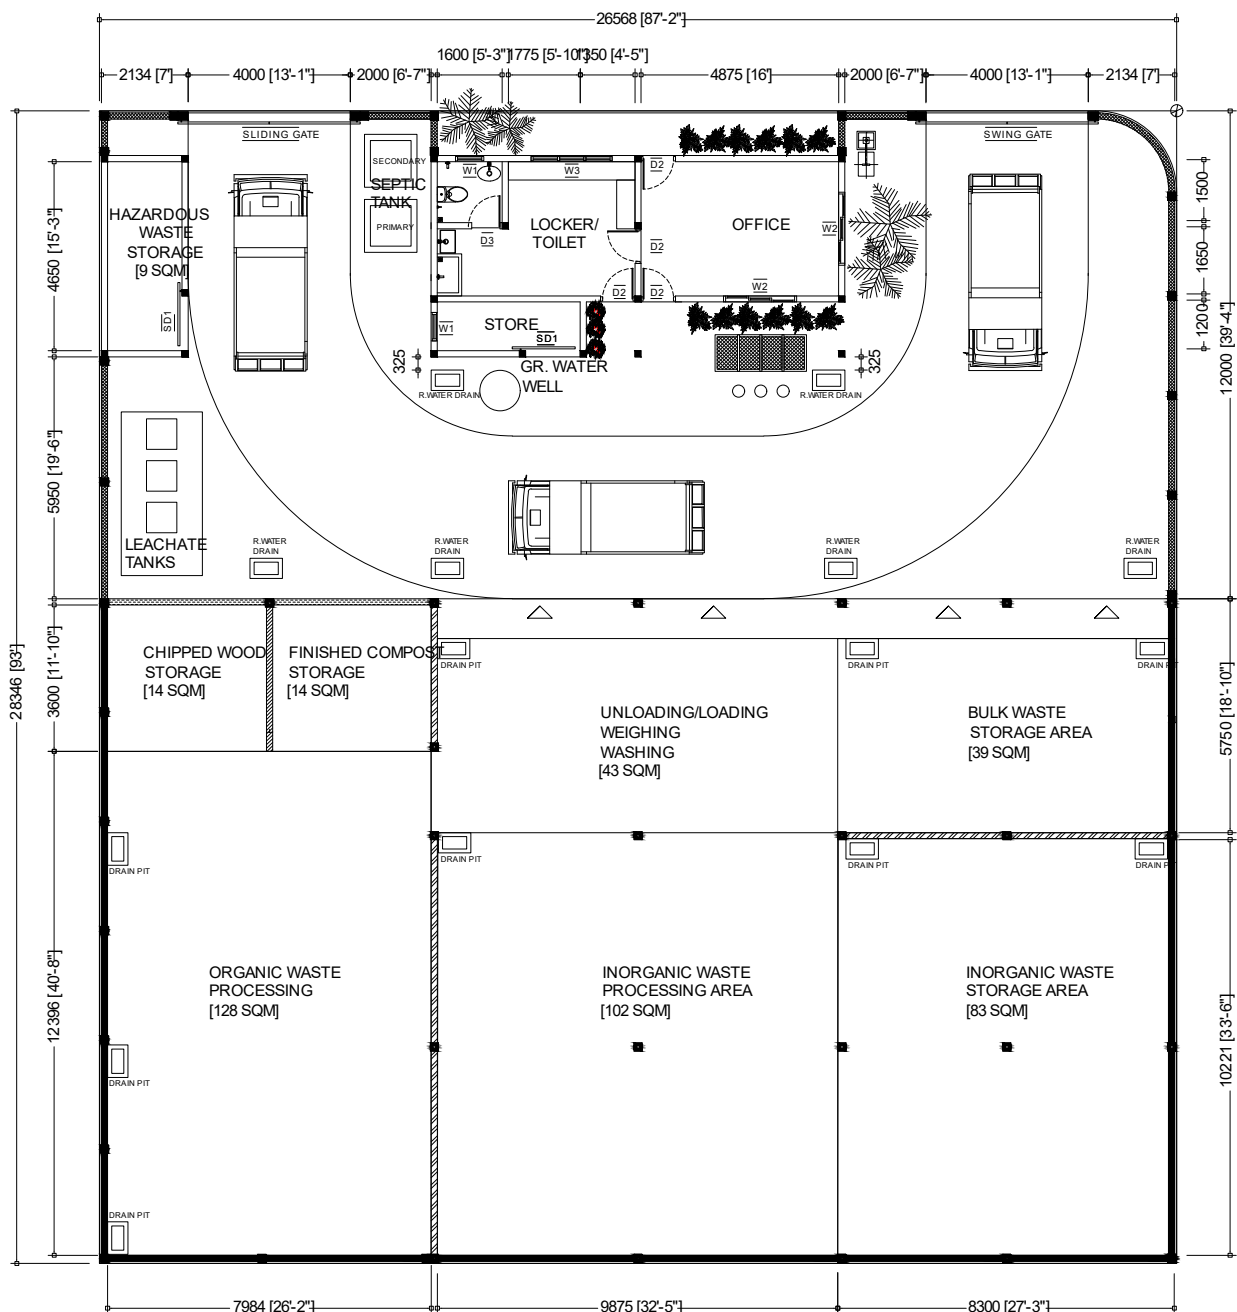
Schematic layout of IWRMC proposed (scaled site plan given in Appendix 4)
